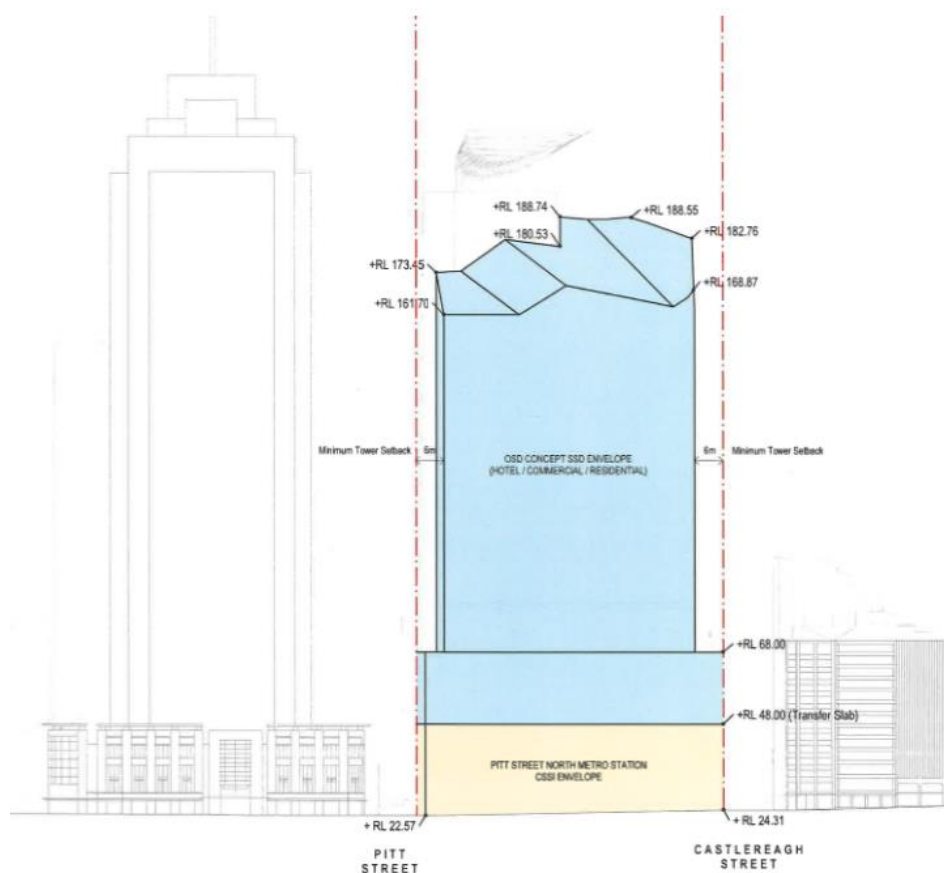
Pitt Street North Concept SSD DA – Envelope – South Elevation (Source: SSD 8875 Concept Stamped Plans)
